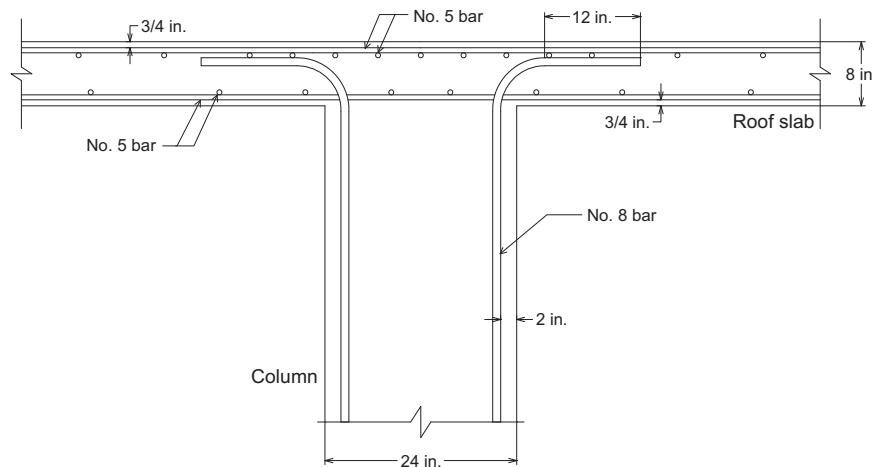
An example of details of column bar anchorage in roof slab-column joints (scaled)
